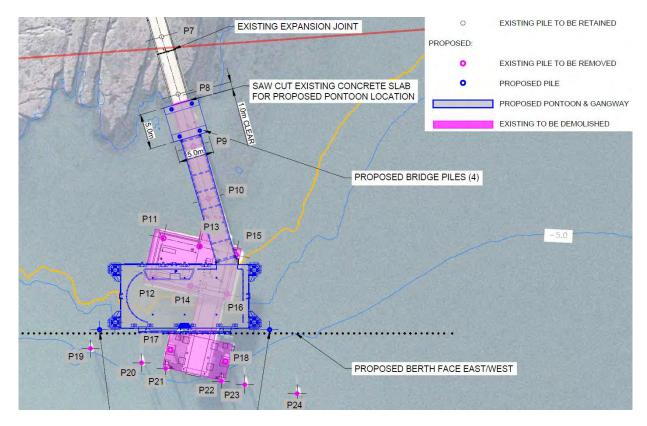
Proposed Kissing Point Wharf design (Drawing SK 10, Revision 1)
